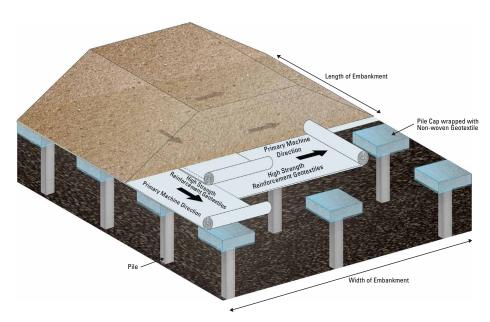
Laying of Mirafi® high strength reinforcement geotextiles over individual pile caps
